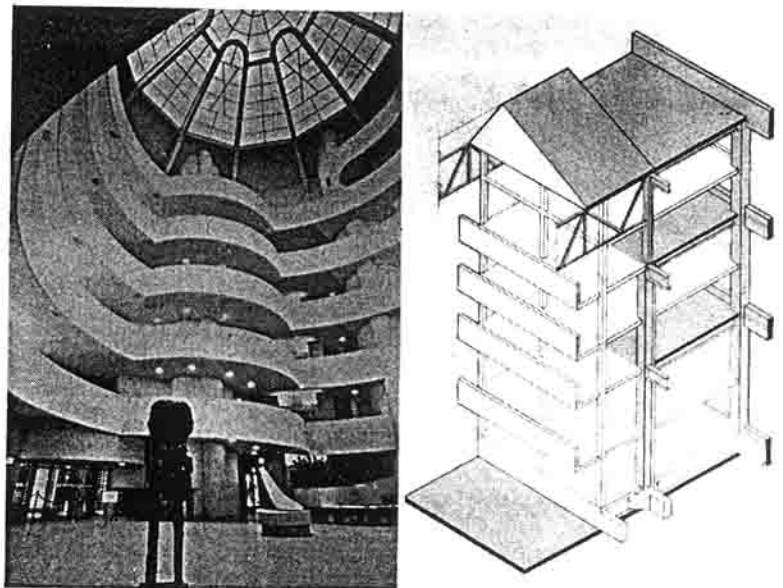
(Left) Solomon Guggenheim Museum, New York, photo of interior showing layered cantilevered corridors. (Right) Isometric of Constitution Quarters typical bay showing original structure shaded and new infill floors rising off cantilevered gradebeams and gallery slabs.
